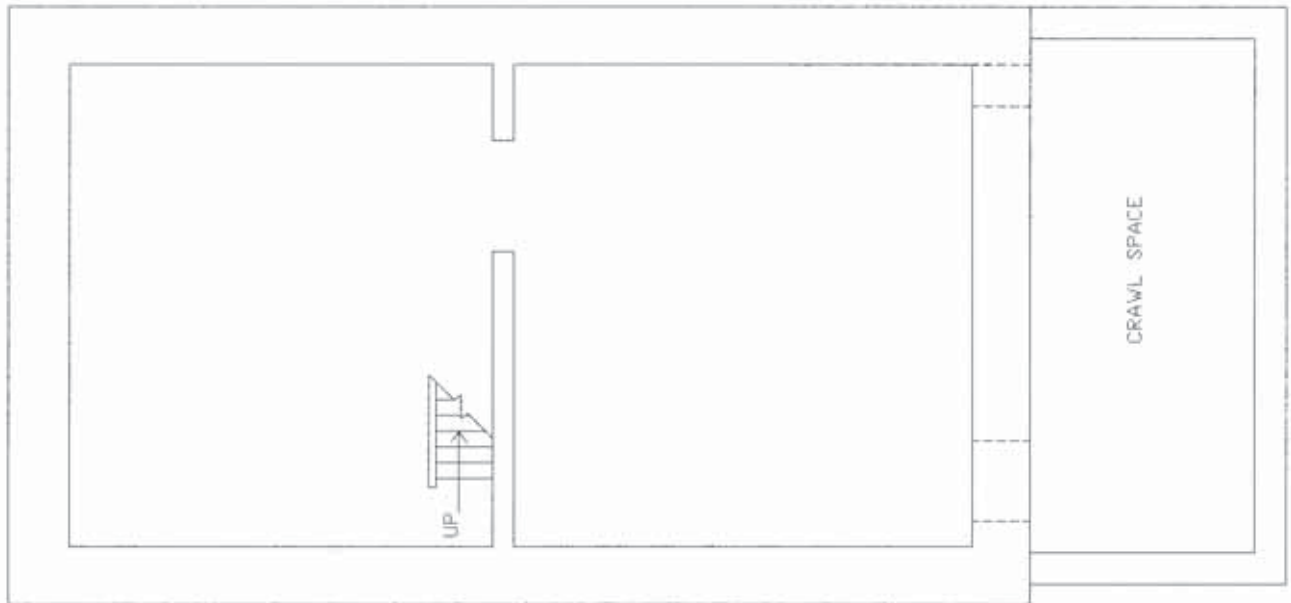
Basement Floor Plan from August 1998 Floor Plan drawings, Sheet A-1 (N.T.S.)
